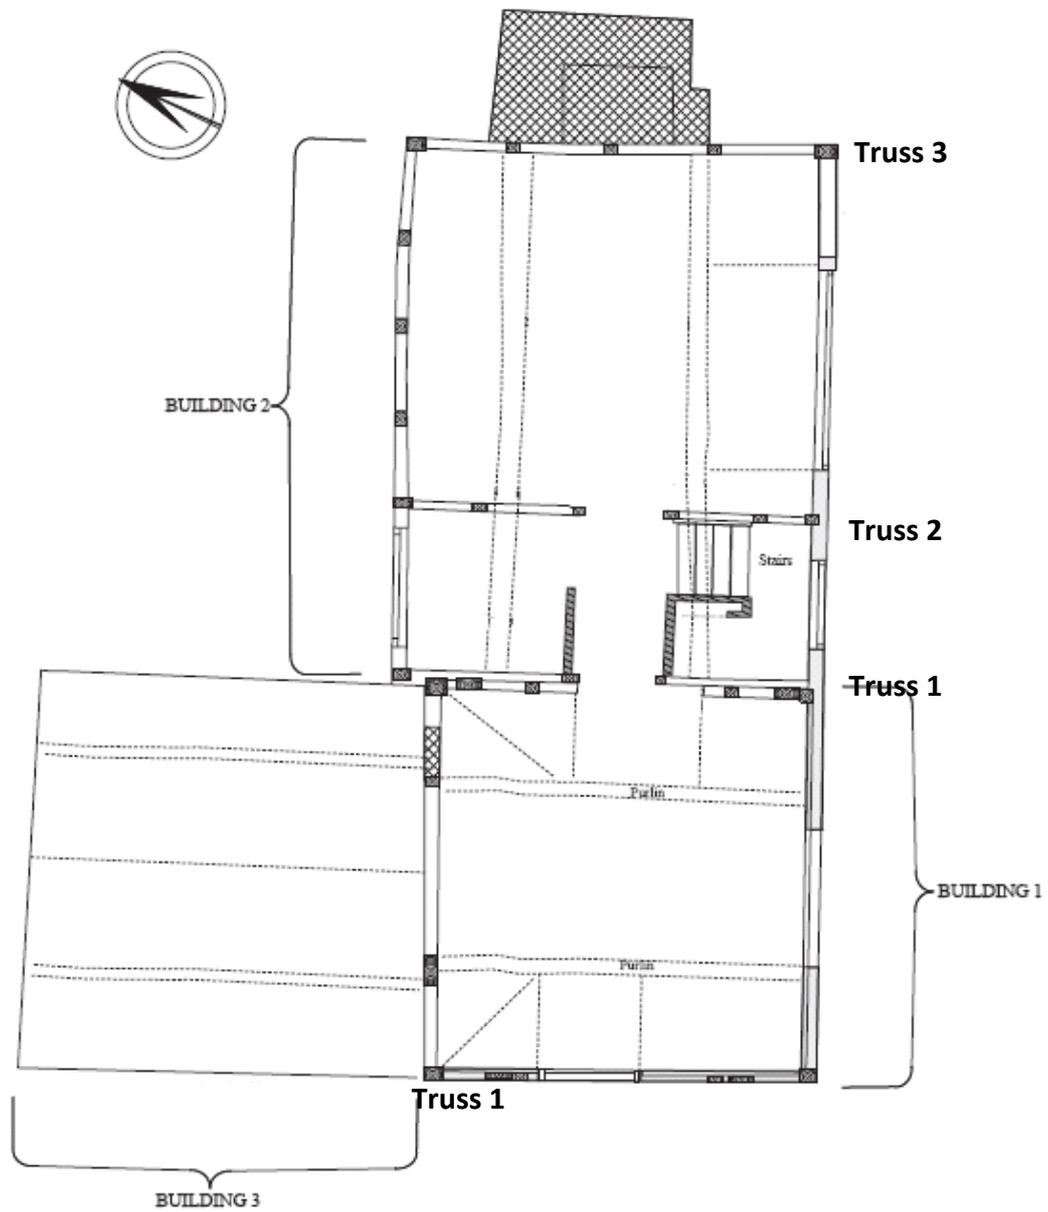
Plan of Winnall Lodge, Lineholt to show layout of buildings 1–3 and the position of the trusses (after Mike Napthan Archaeology)
